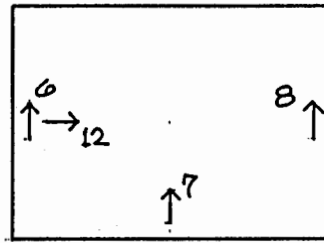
ELEVATIONS AND INSTRUMENTATION PLANS
